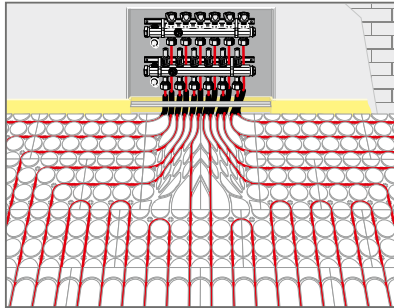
Example for line installation with 6 heating circuits and two-piece manifold panel
